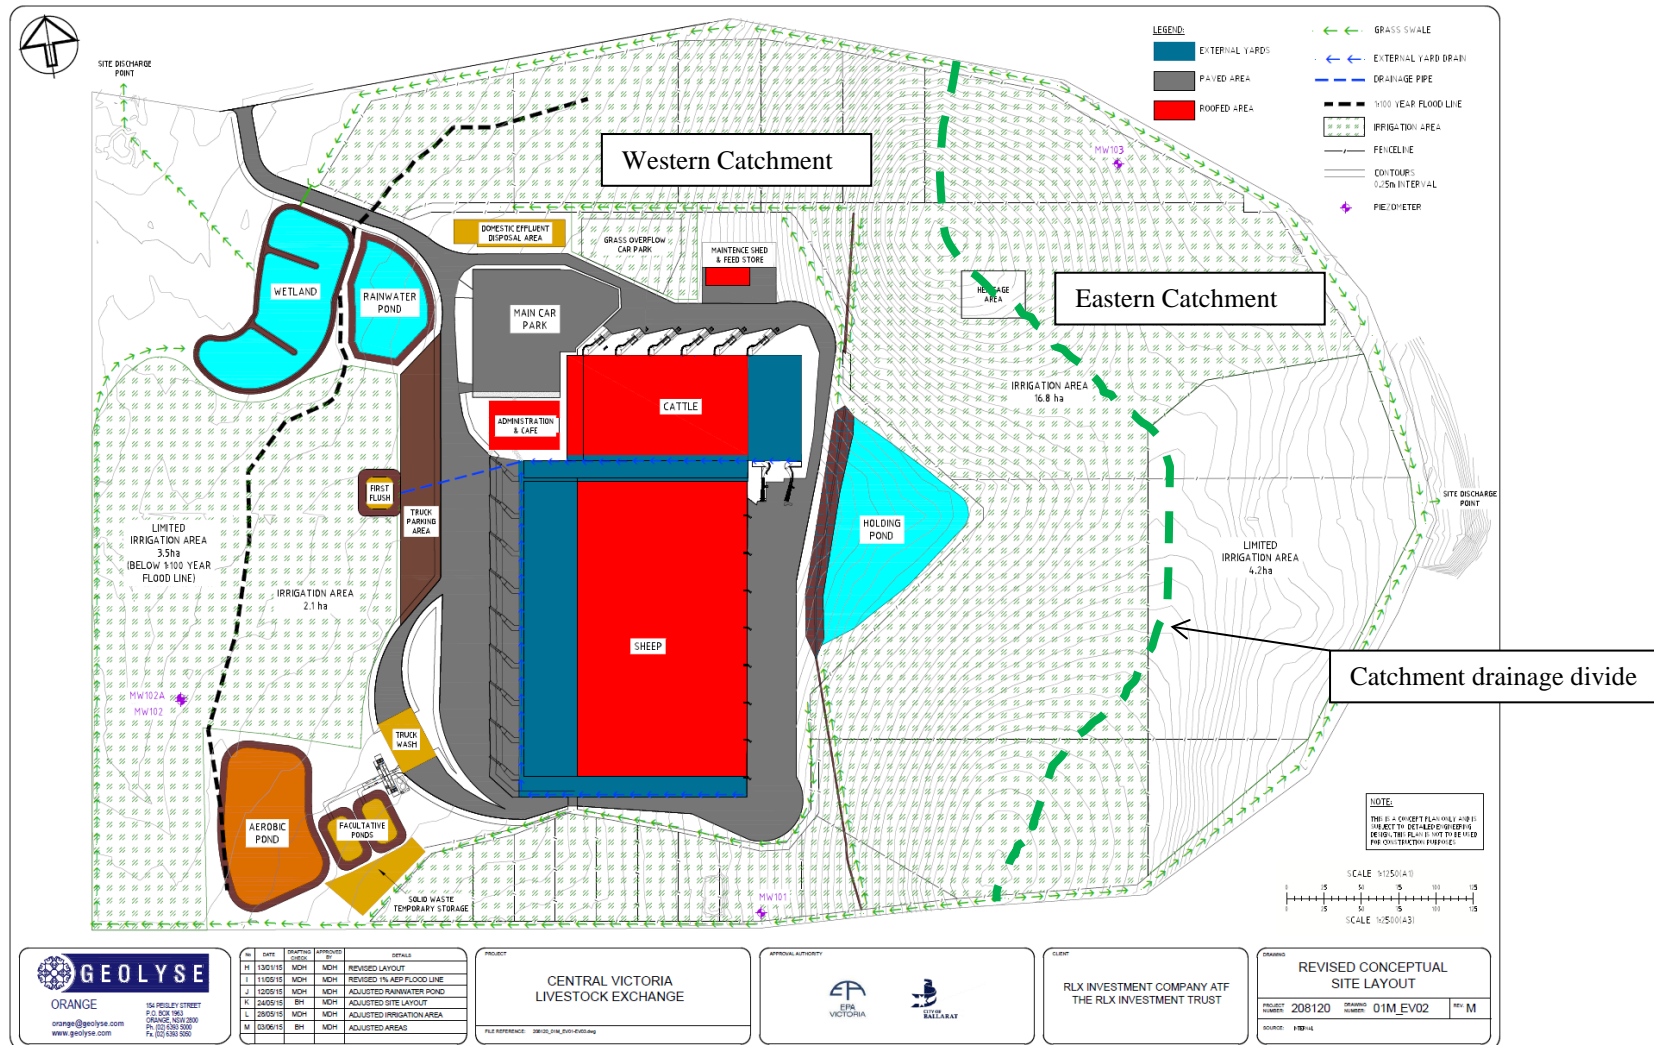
Revised Concept Site Layout Plan (Revision M) marked up to show the catchment drainage divide
